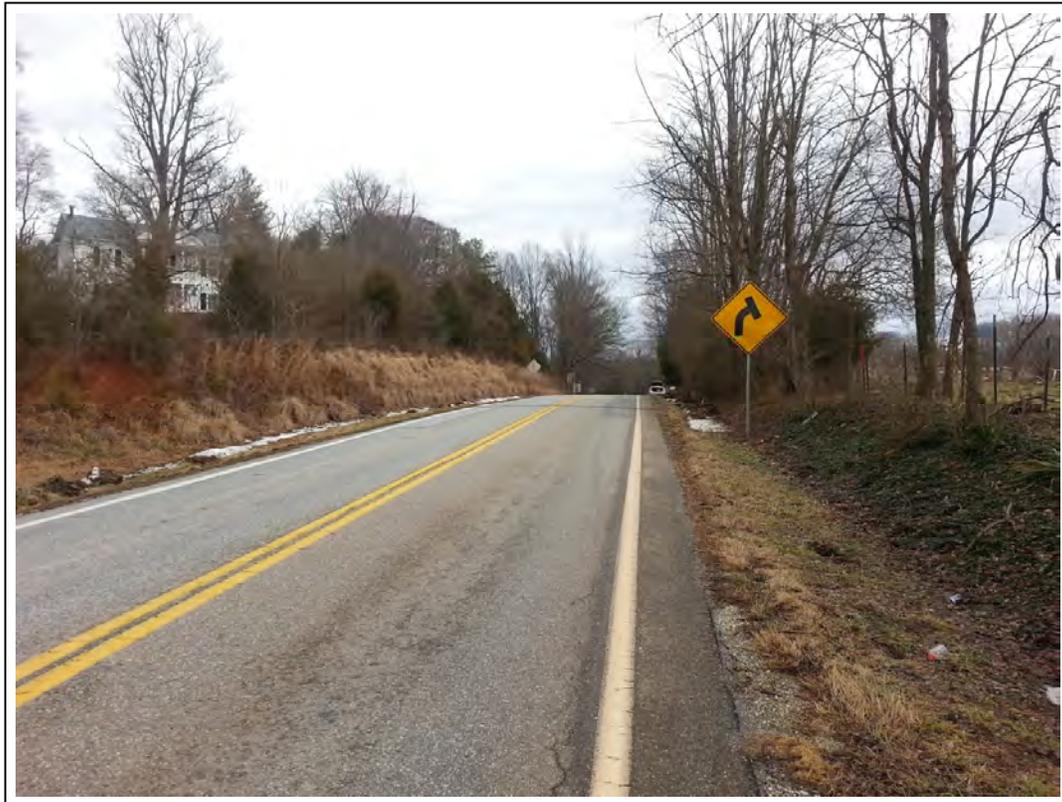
View of Tye Brook Highway (Hwy 56) counter set-up, looking east.
